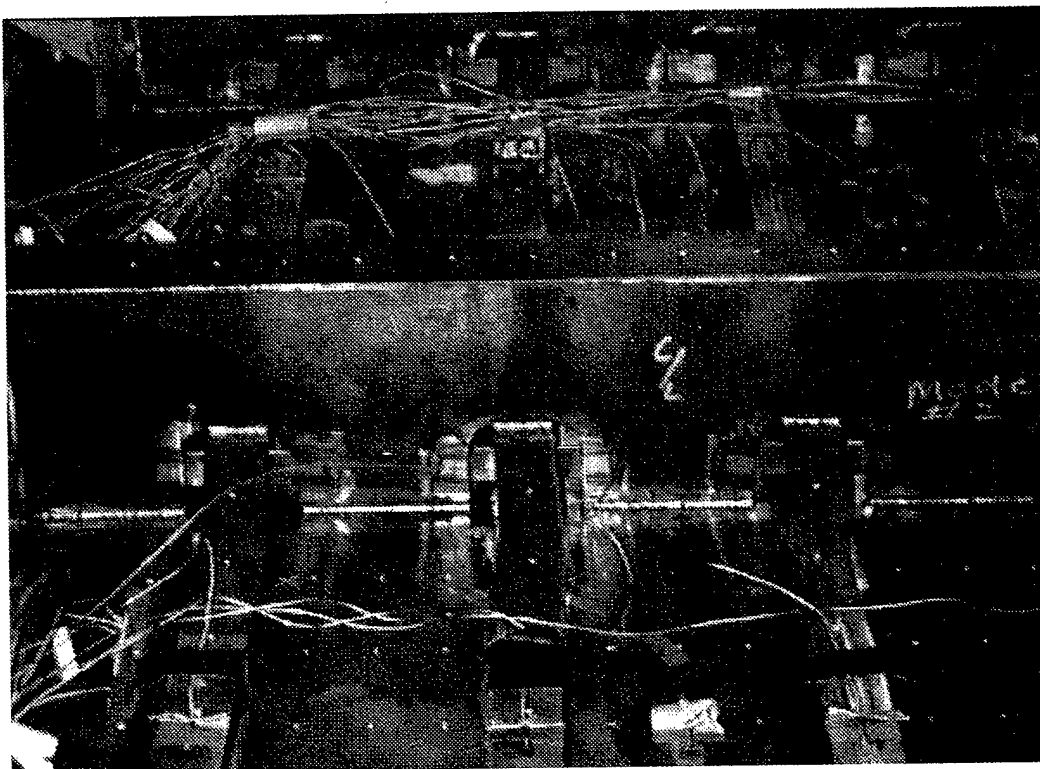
Stiffener Failure in the Forward Bay of Grillage 0595
